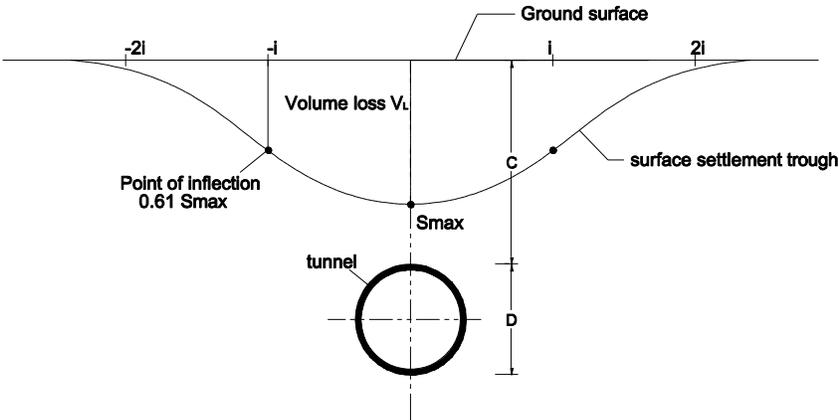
Transverse settlement trough due to tunnelling (Peck, 1969)
